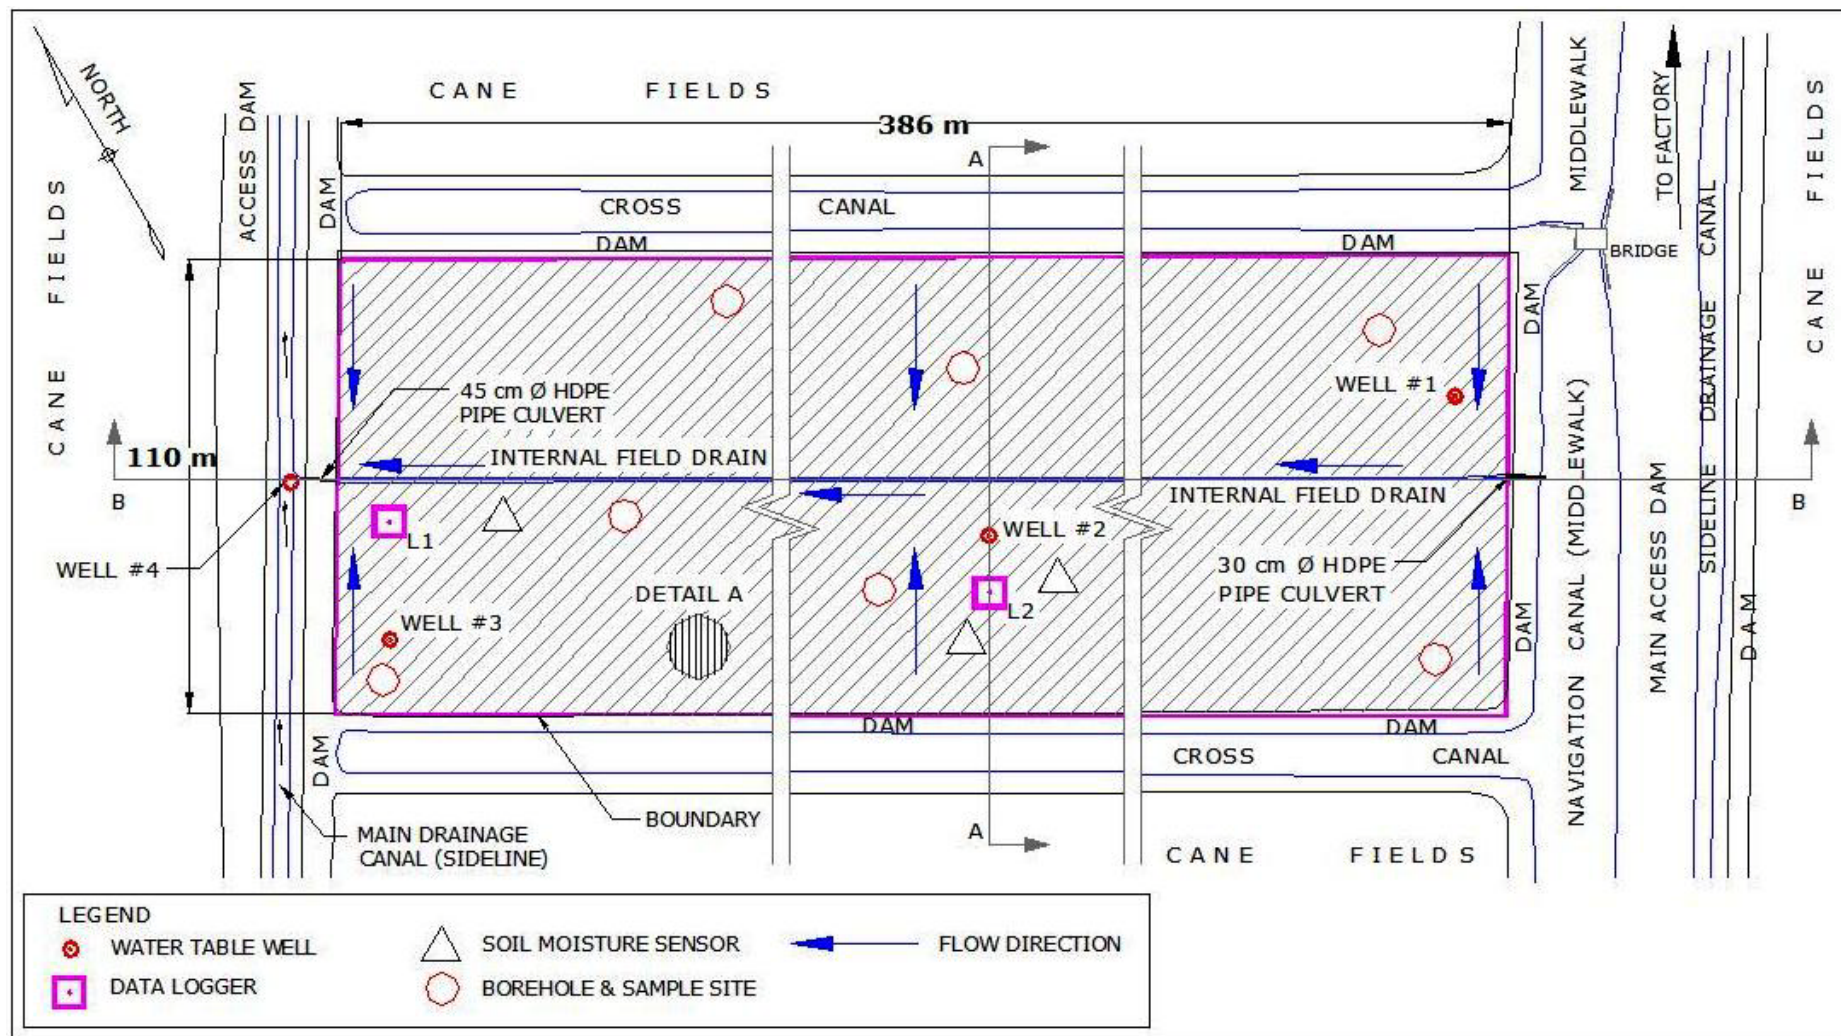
Site plan of field CM 57 showing the layout of the surface drainage system and location of field instruments.
